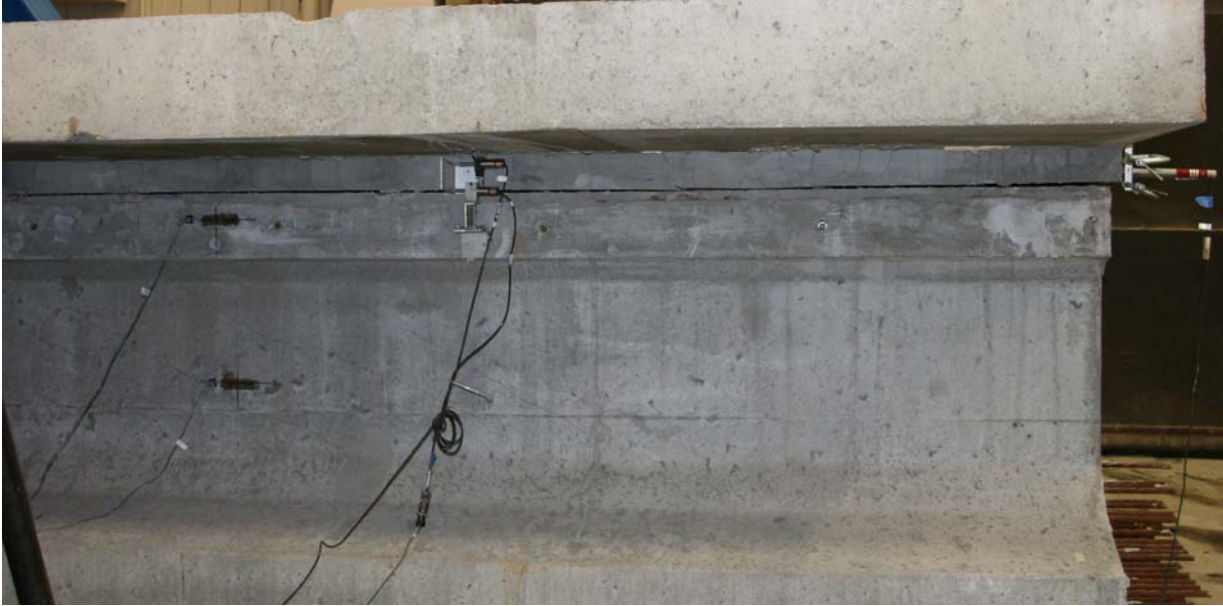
Photo. Haunch connection on south face at east end of test specimen when applied shear load in east end was equal to 1846 kN (415 kips).
